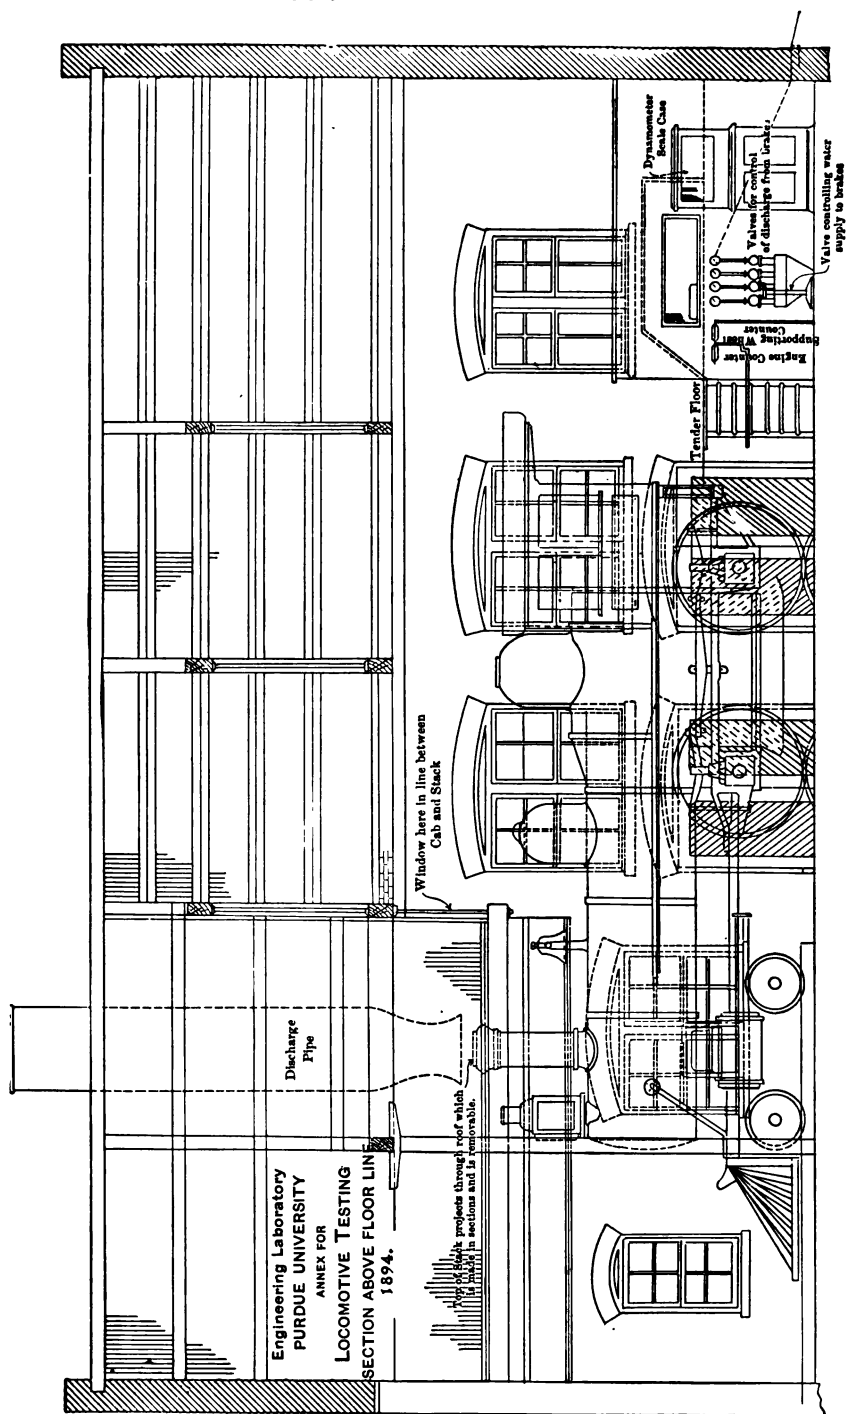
Section of Building, Second Plant, Purdue University, 1894.
